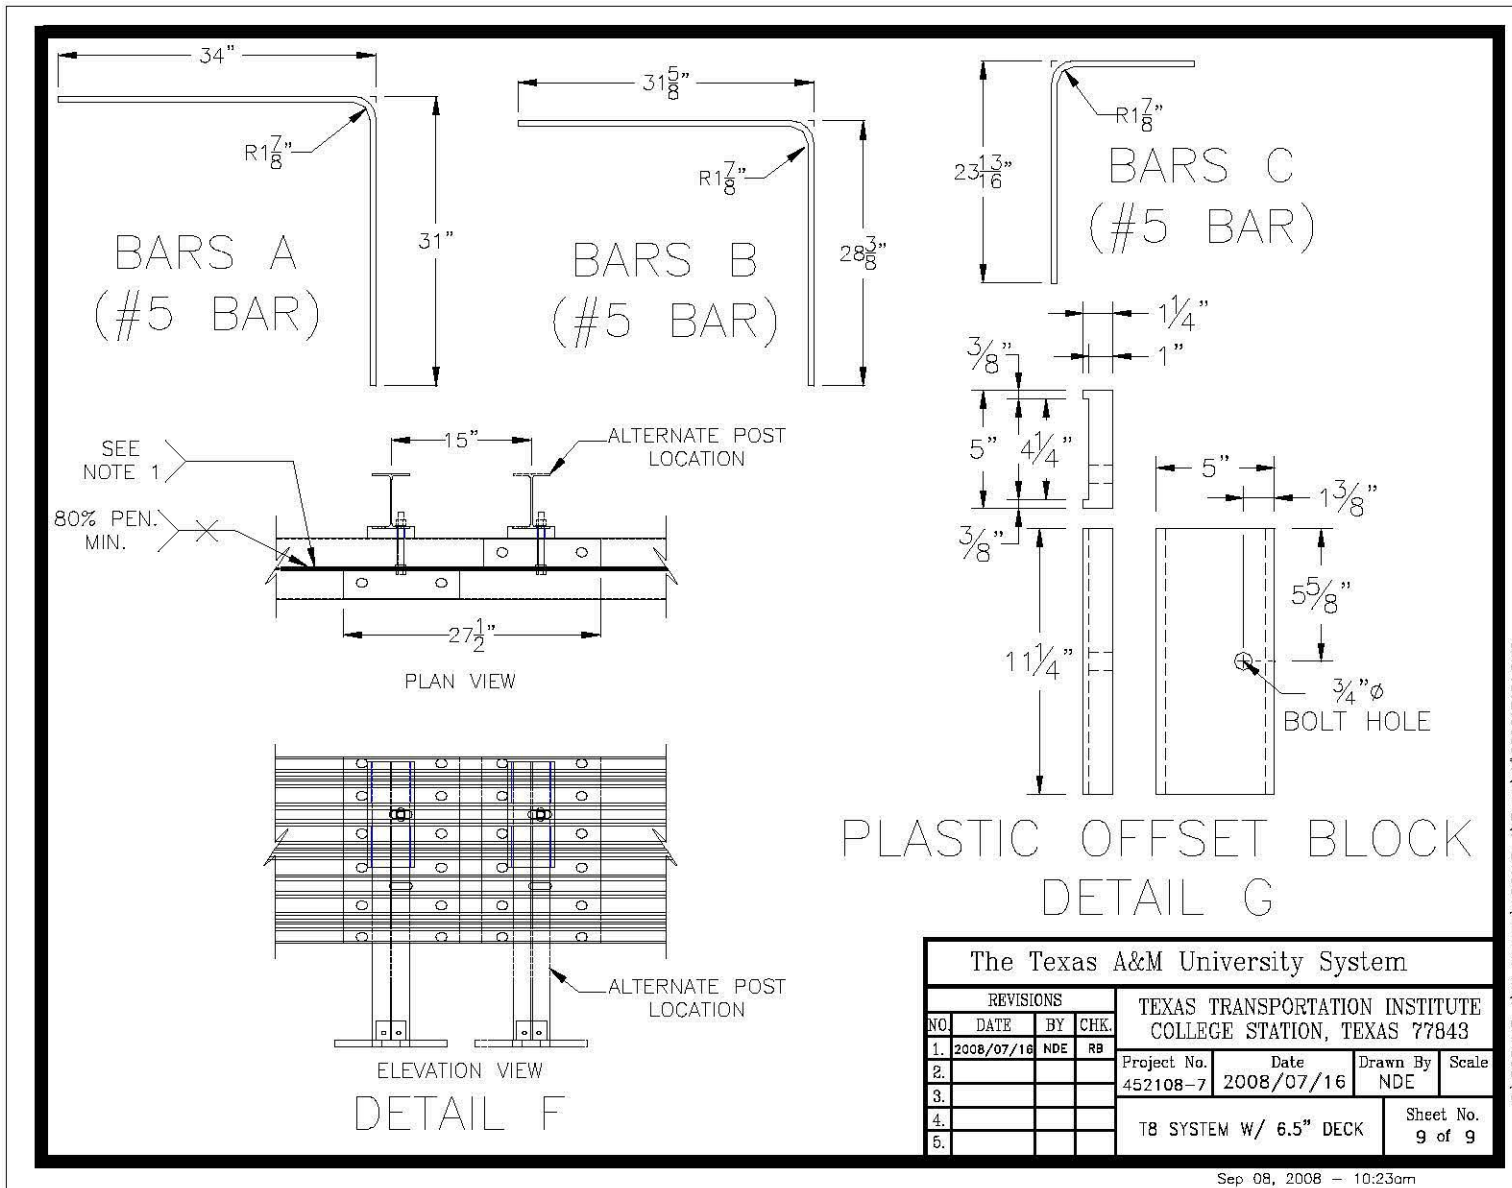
Details of the T8 Bridge Rail Installation – Miscellaneous Details.
